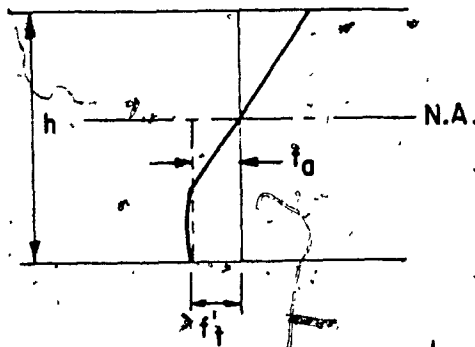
Stresses in concrete beam immediately before cracking
